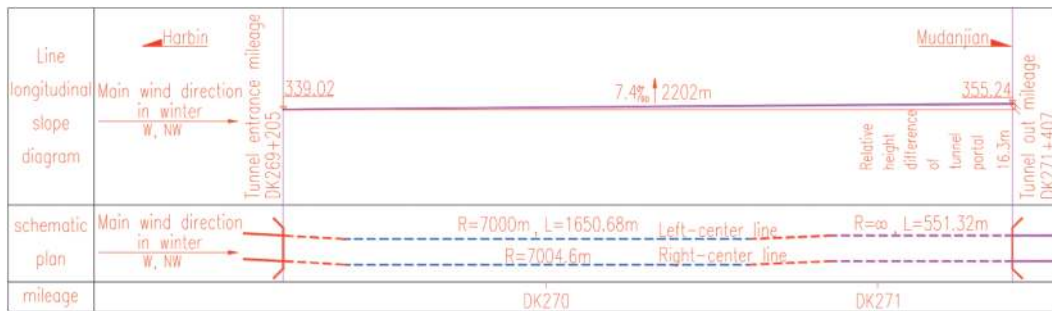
Schematic diagram of the plan and longitudinal section elements of the Mabei Tunnel on Harbin-Mudanjiang railway.
